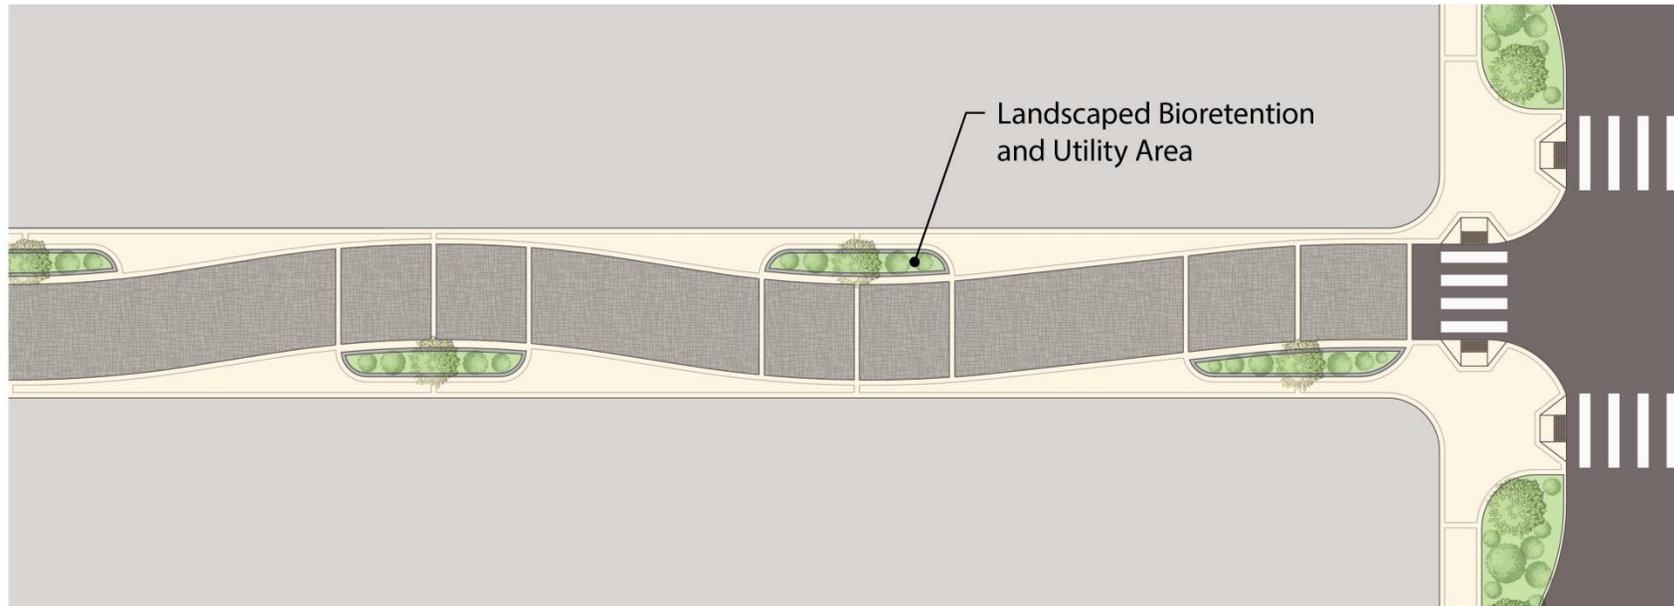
Woonerf Street Typical Hypothetical Block Plan
